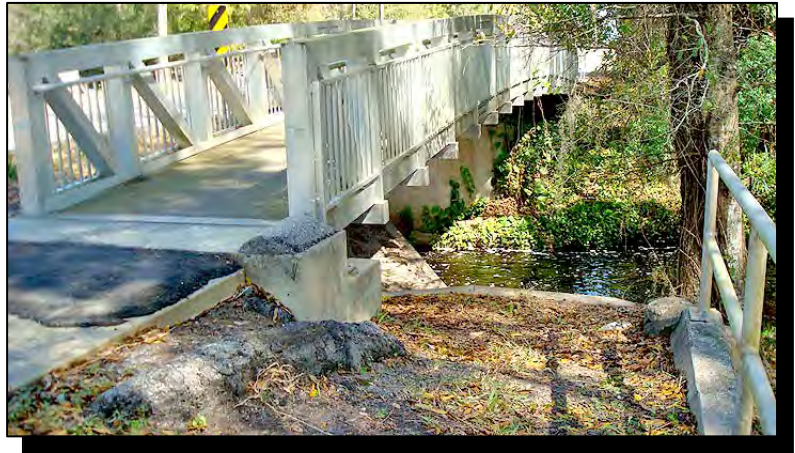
Eastbound approach to bridge on Taylor Road, east of Boggs Ford Road
